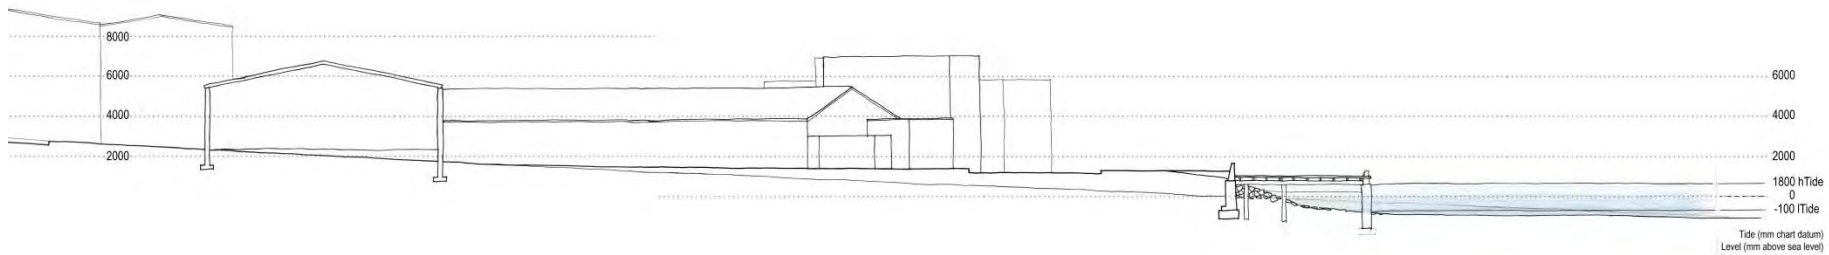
Section FF through the existing site from Main Road to the water's edge. (Author, 2013)
